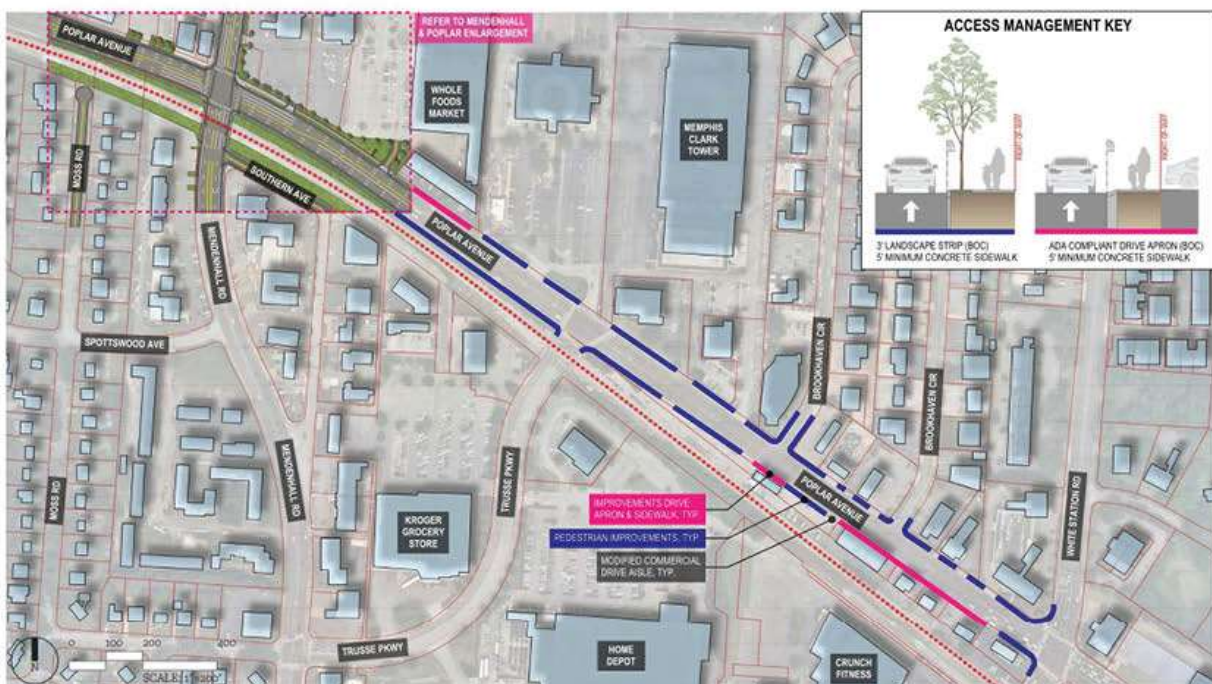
Mendenhall Road to White Station Road Existing Aerial and Concept Plan
